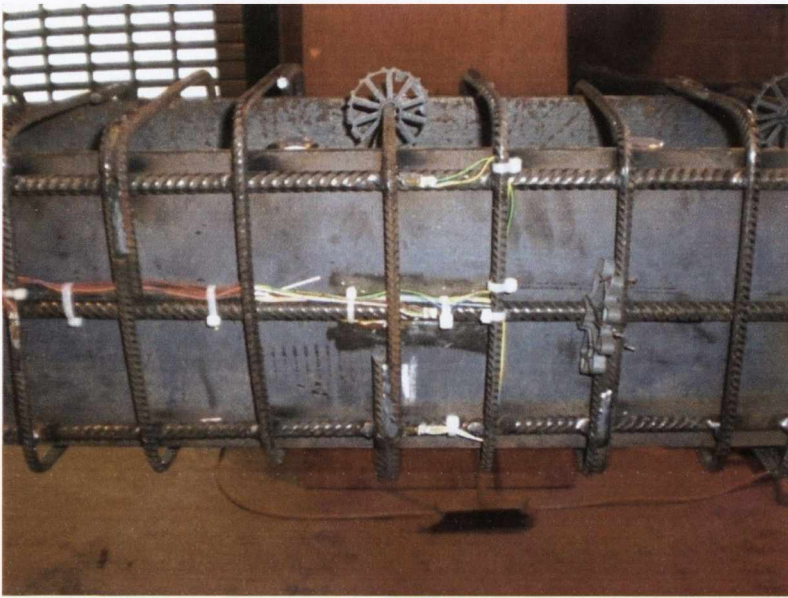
Steel and Concrete Strain Gauge Location and Connection Detail
